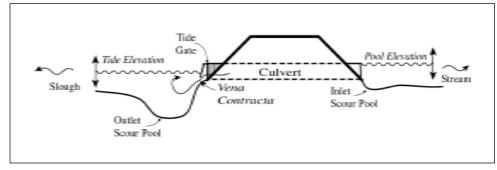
Lateral schematic view of a flood box with a top-hinged tide gate attached to downstream end of culvert.
